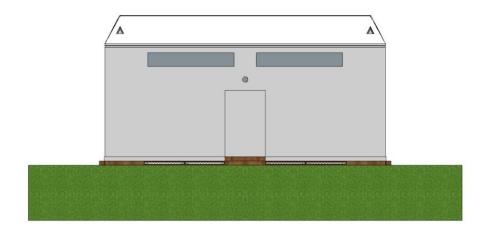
2D sketch showing typical elevation with chimney reinforcement
